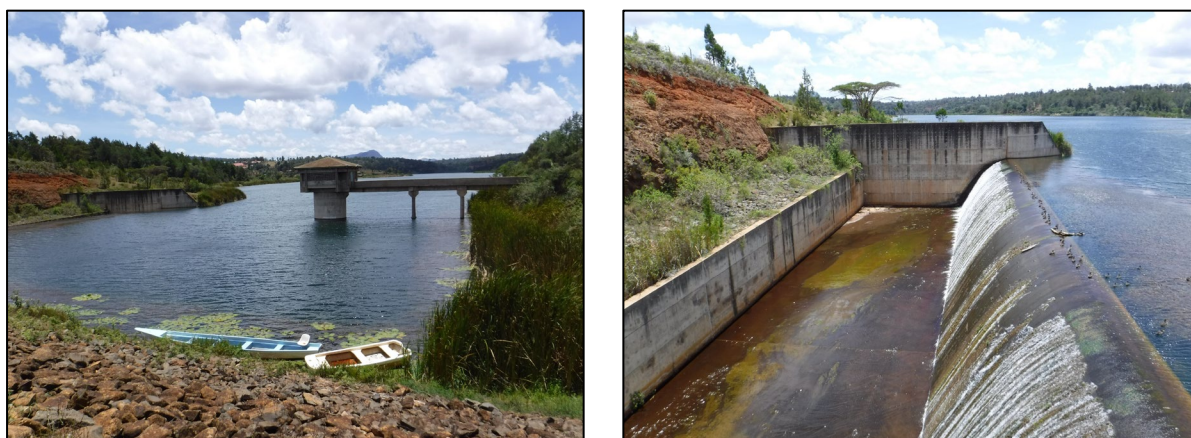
(left) and 4 (right): Moiben Dam, showing draw off tower and spillway, which was overflowing at the time of site visit
